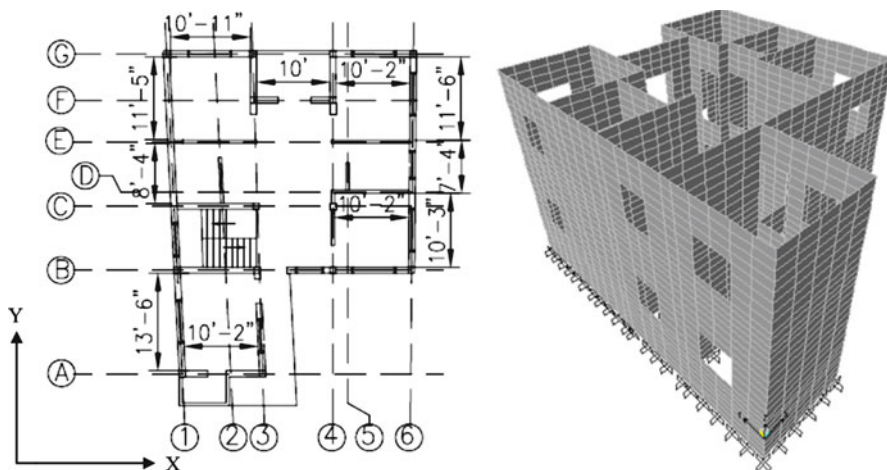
Typical floor plan with the gridlines and 3D computer model of the building
